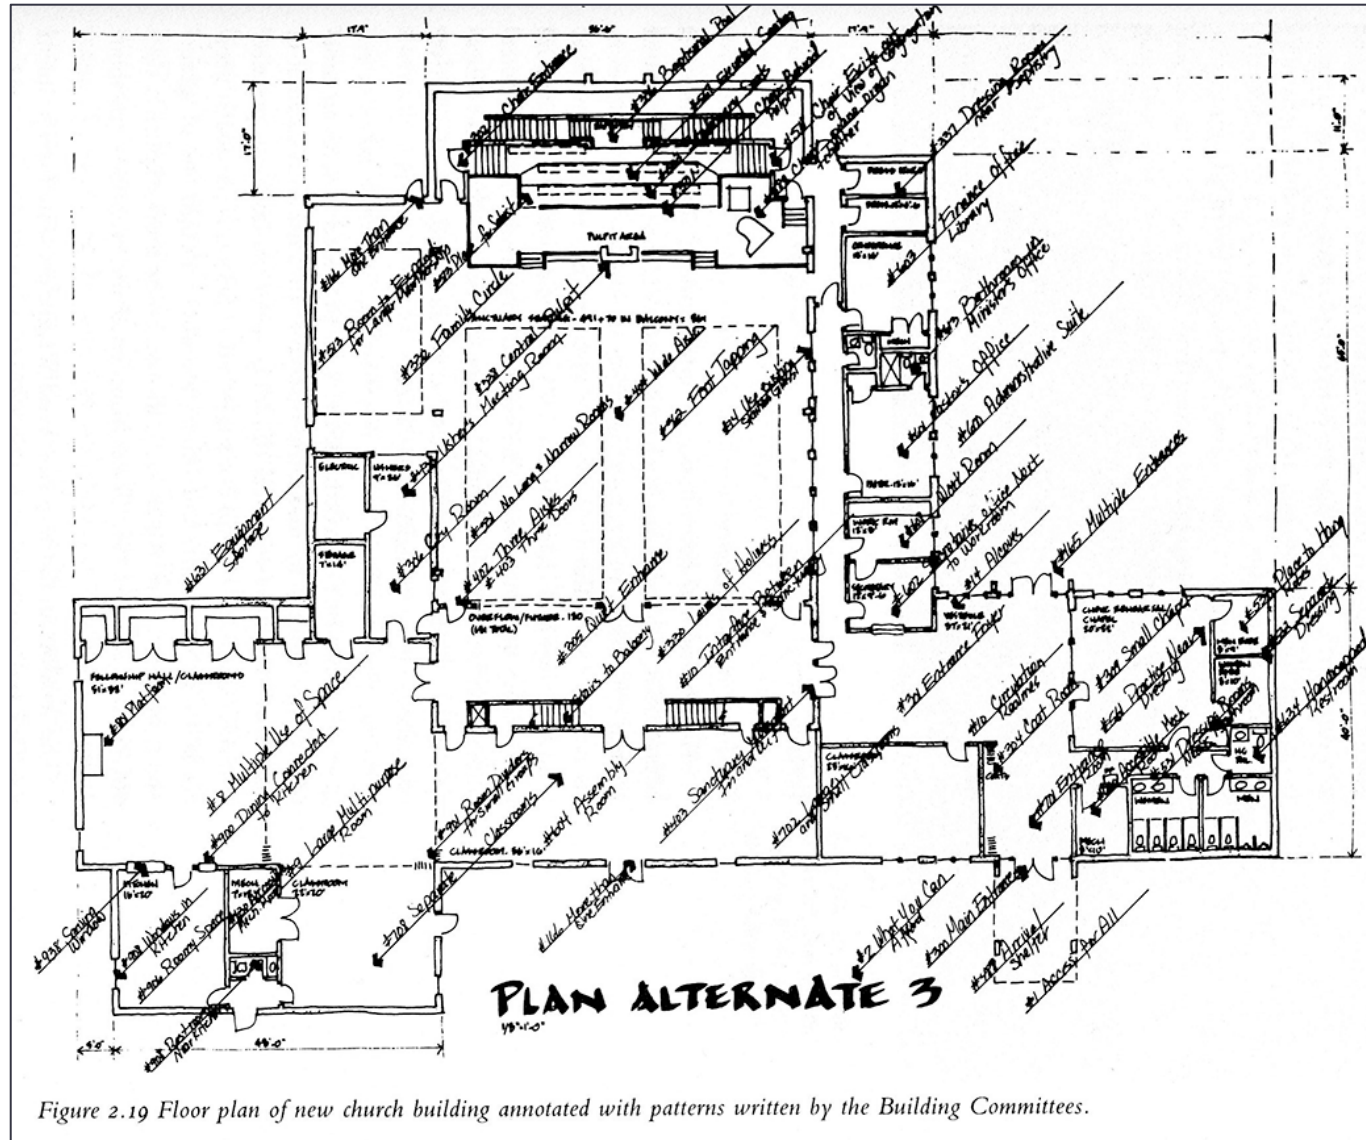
Floor plan of new church building annotated with patterns written by the Building Committees.
